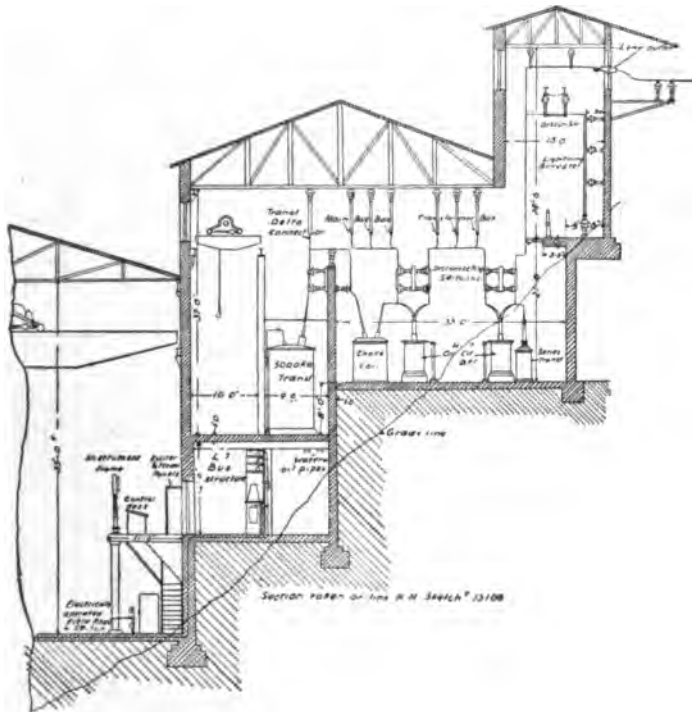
Section of transformer and switching house, 60,000-volt plant
